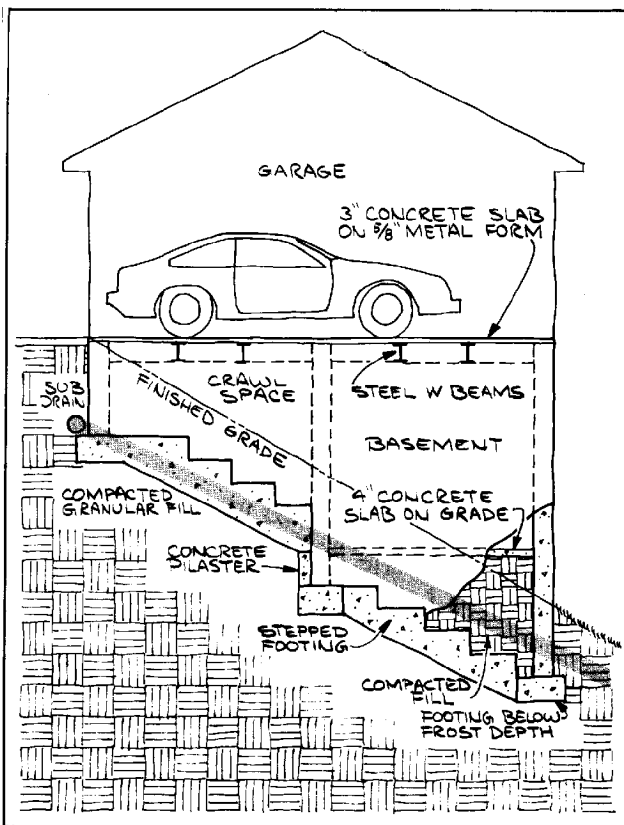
A typical step footing supports a garage built on a downhill slope. Stepping keeps the footing at a uniform depth for frost protection. Also, it eliminates the risk of undermining the footing during construction.
